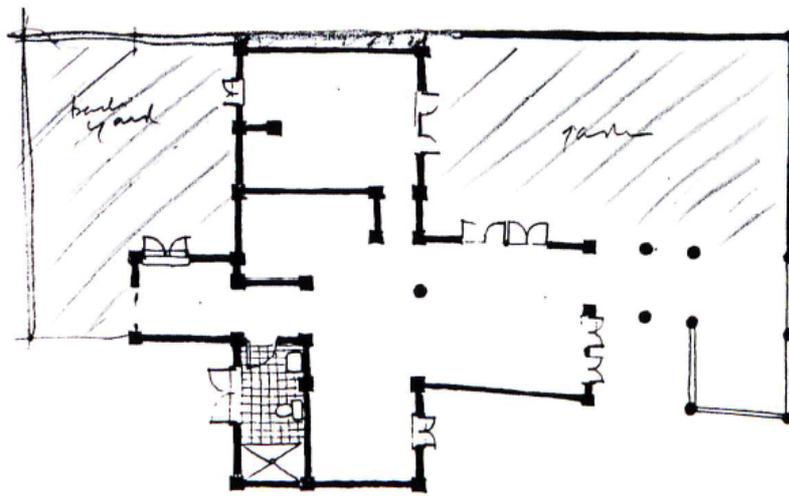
Sketch of the floor plan of Ms. Duran's house in Mexicali.
